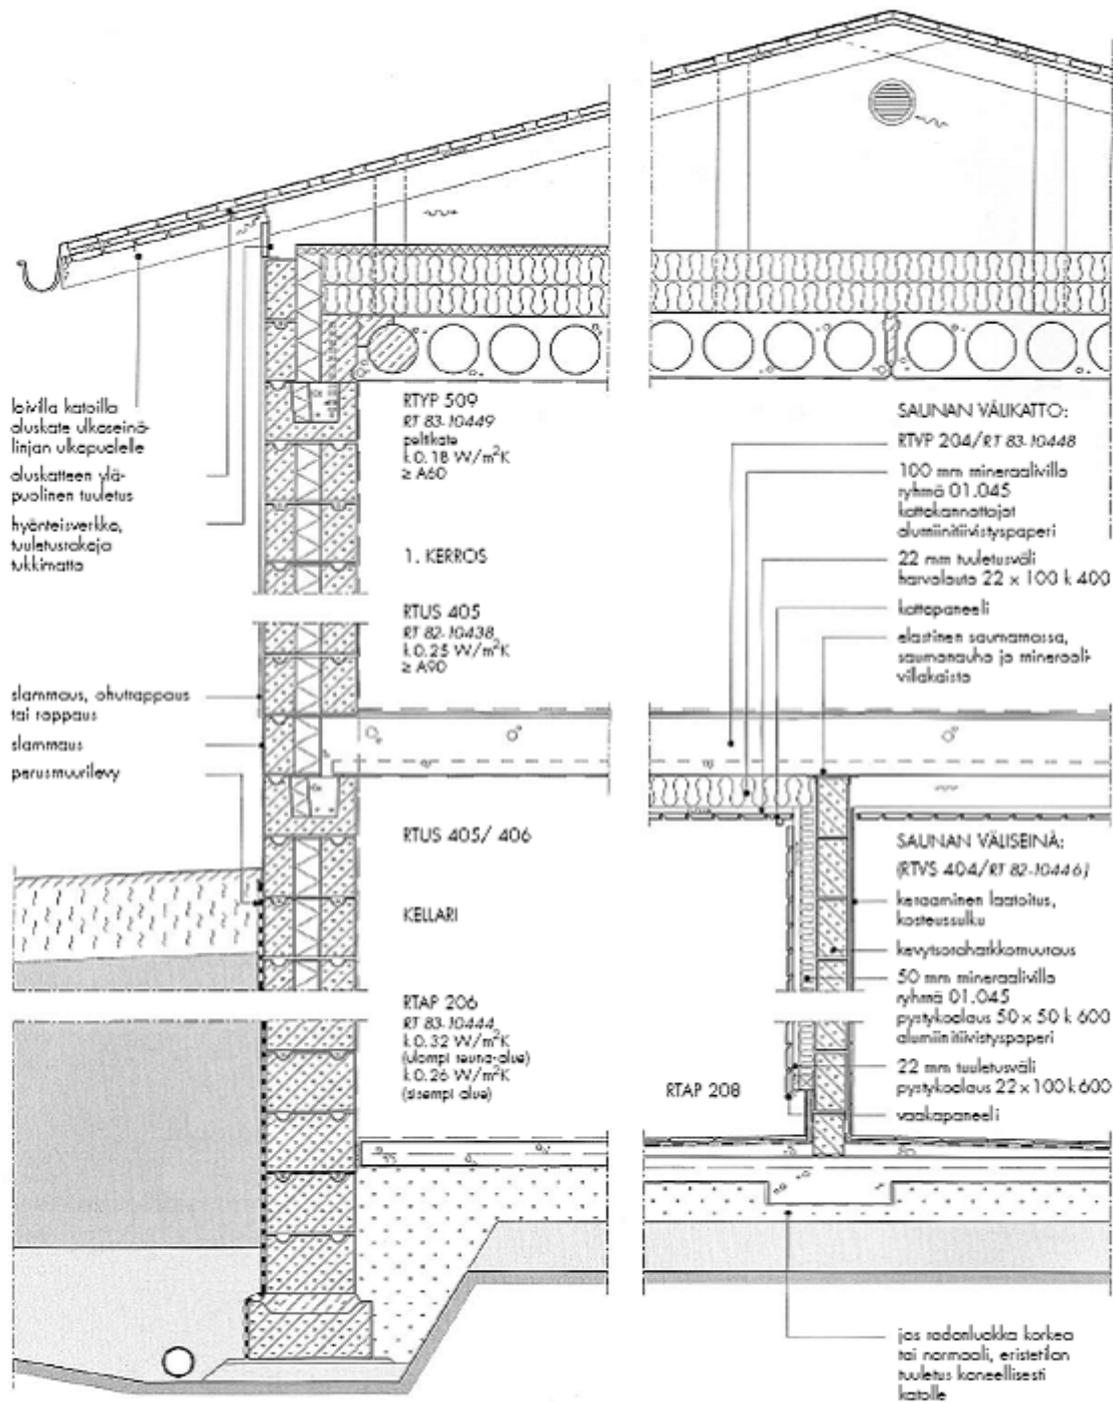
Examples of the structures of the brick house. Longitudinal exterior wall and partition of the sauna, 1:20. /5/
